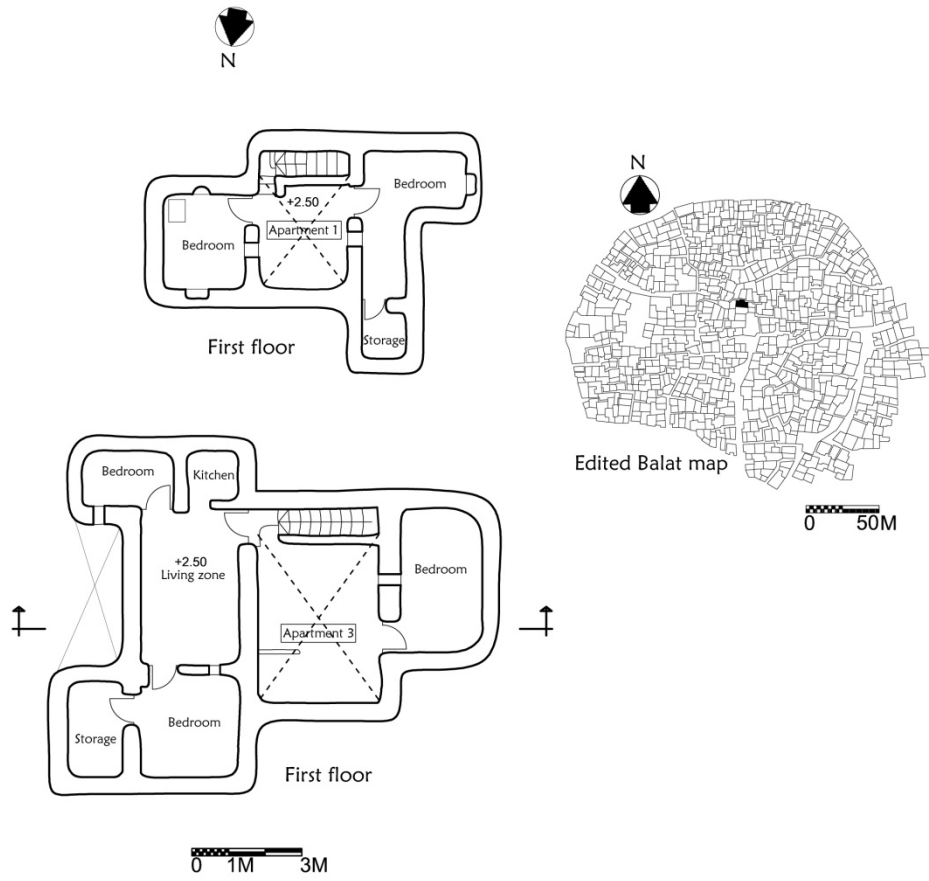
First floor plans for the same extended-family house showing apartment one and three.
